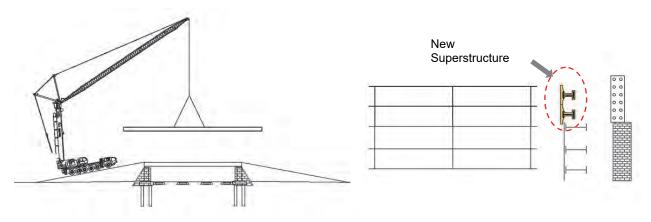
Reconstruction Procedure of Step 3 for Type-2 Bridge
